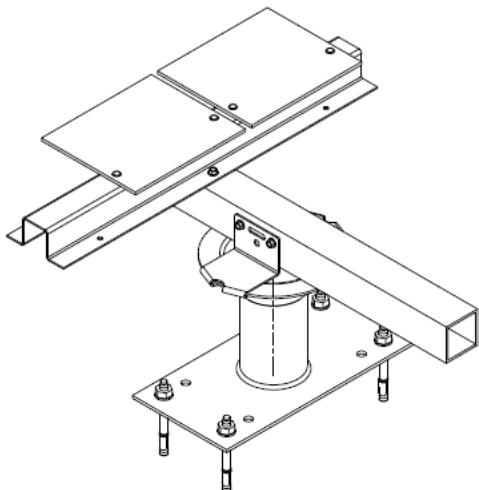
V1: Point fastening kit for roof panels, concrete and corrugated metal sheets.
